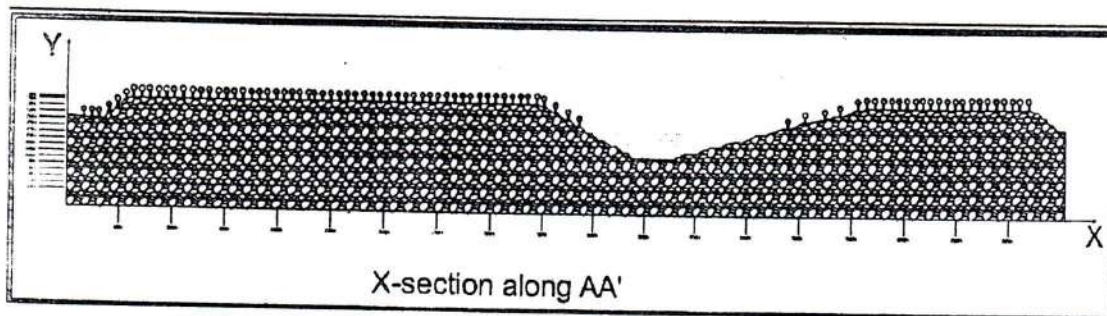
X-Sectional View of Final Stage Reclamation Plan
